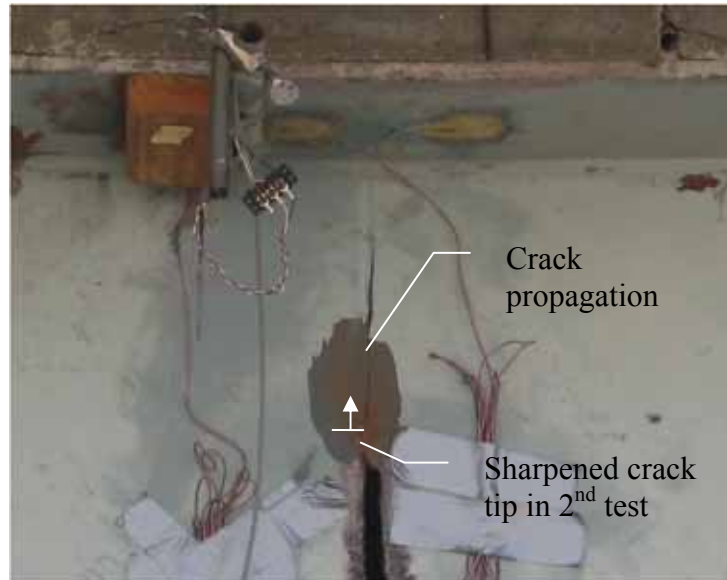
Crack propagation in fractured girder outside web
